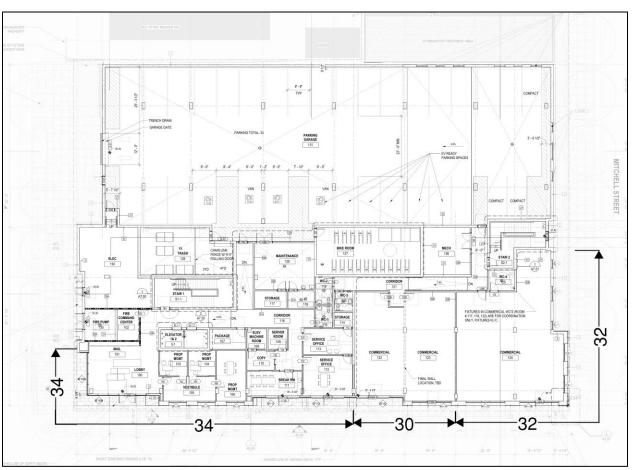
Recommended Window/Storefront Systems and Exterior Door STC Ratings – Level 1
